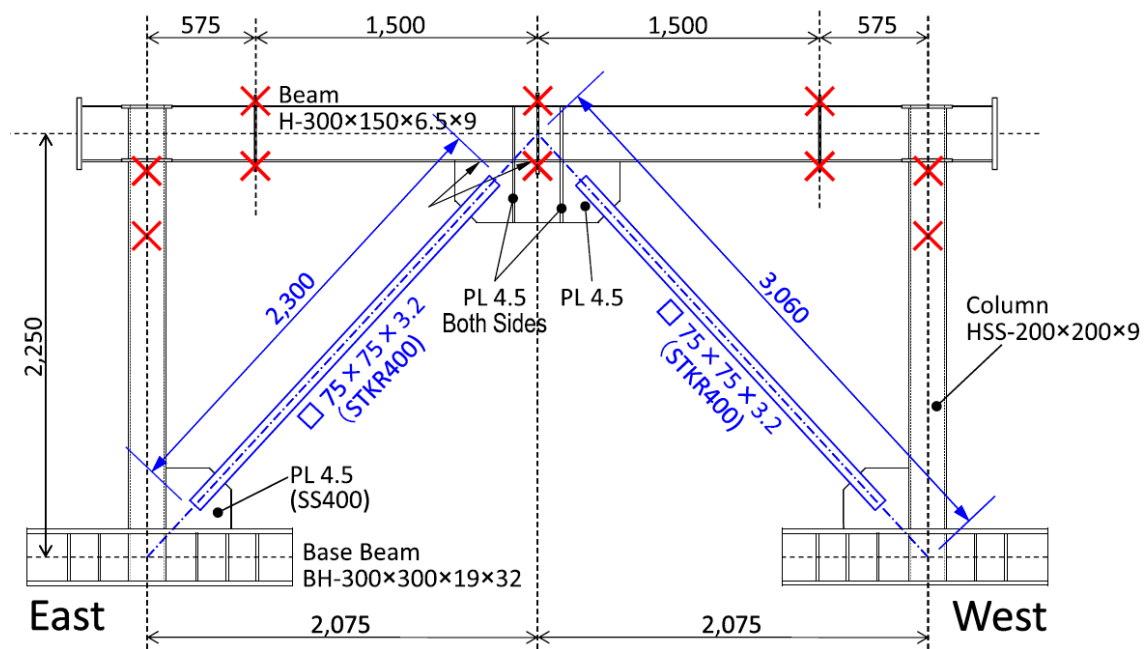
Frame specimen details (Unit: mm)^{5.1)}
